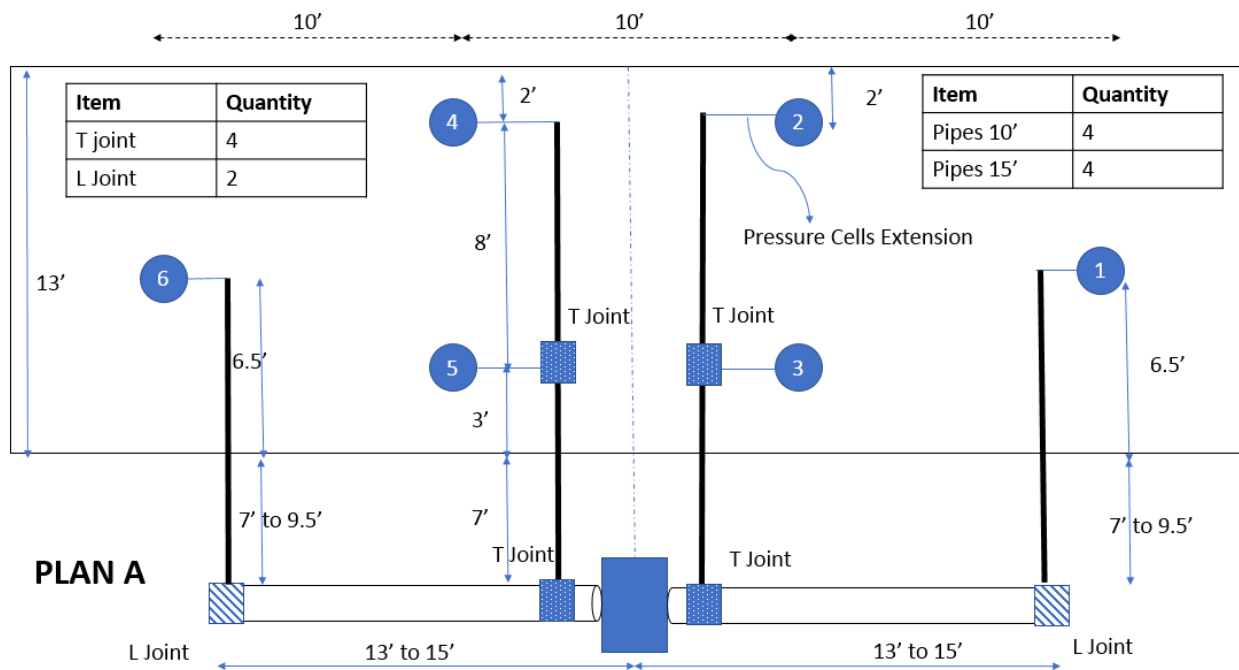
Wiring Arrangement at FM 906 at Testing Site for Unreinforced Section.
